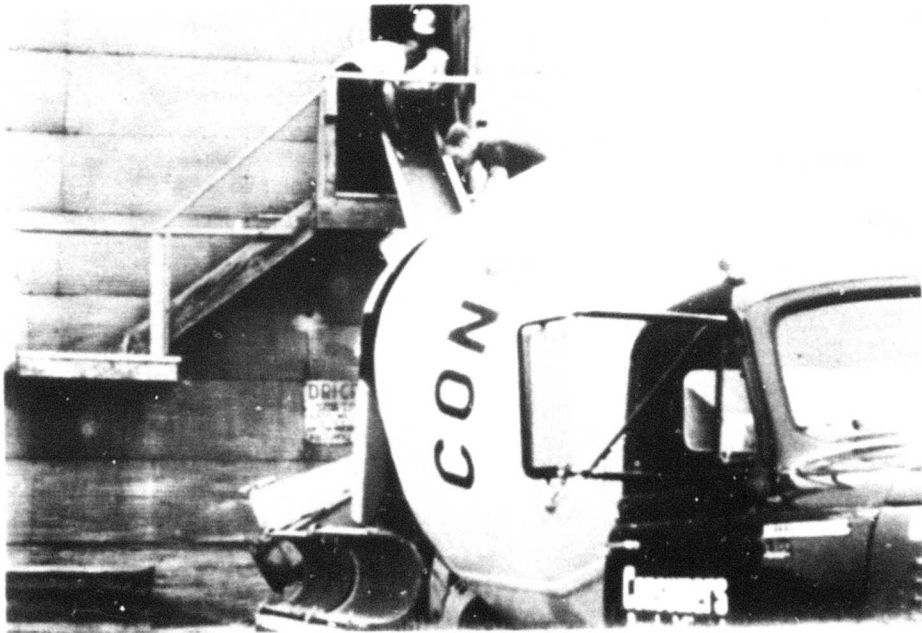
Method 4 Used to Introduce Steel Fibers in the Concrete Batching Operation
